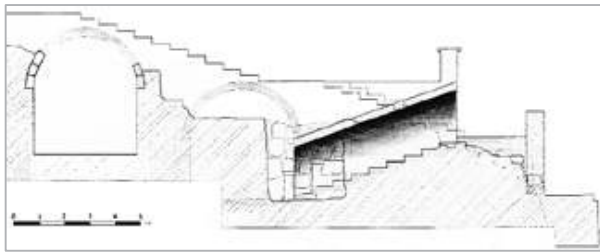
Restoration of the stair bridge according to Raban; West-east cross-section, looking south (Raban 2009: 150, Fig. 5.109).
